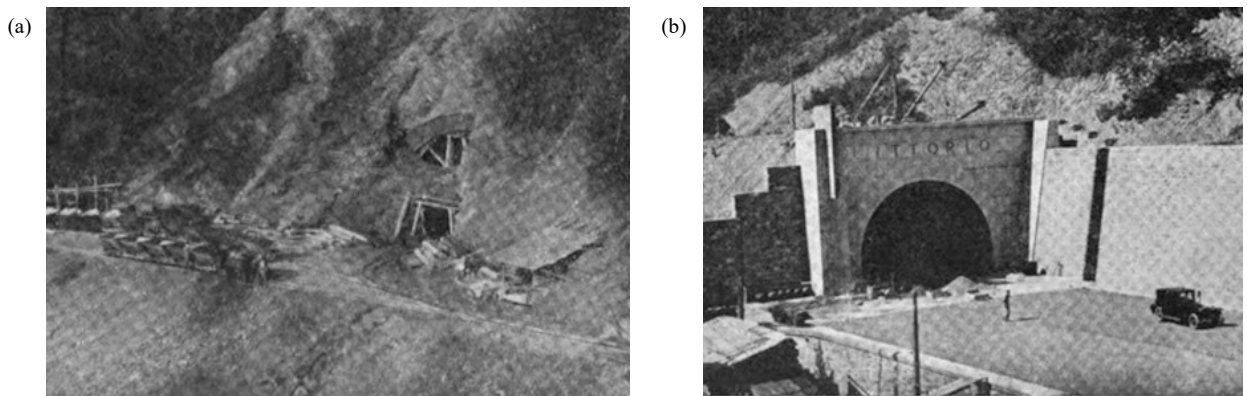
Photographies of the Giovi tunnel: (a) Constructions works; (b) Portal.
